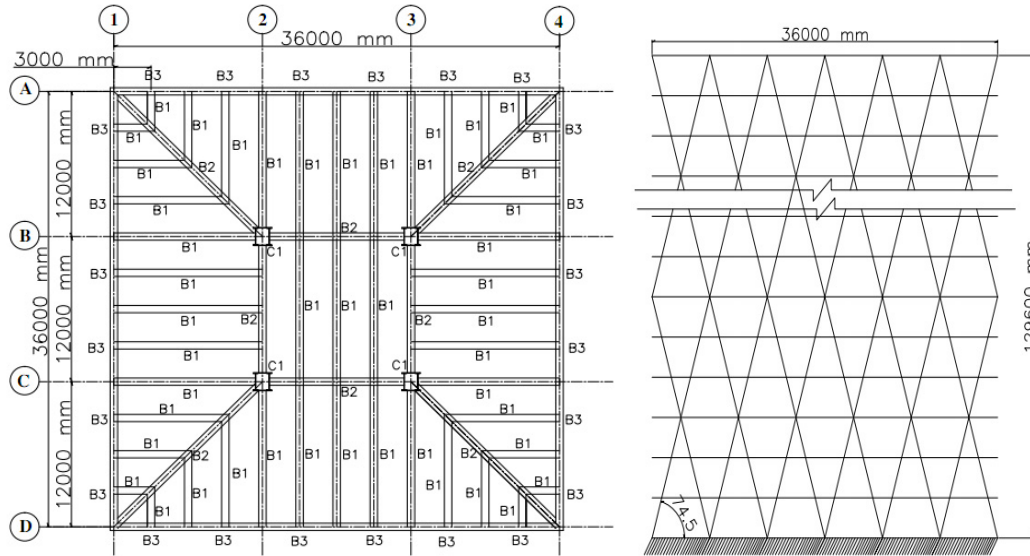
Plan Of Floor (Left), Elevation (Right) (Khushbu Jani Et Al. 2013)
